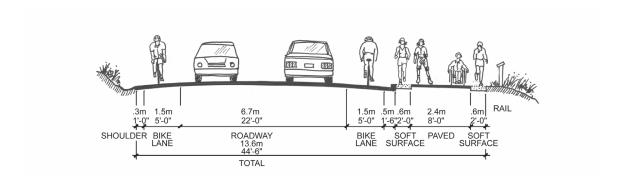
Proposed Development at Lincoln Boulevard at Crissy Field Avenue
